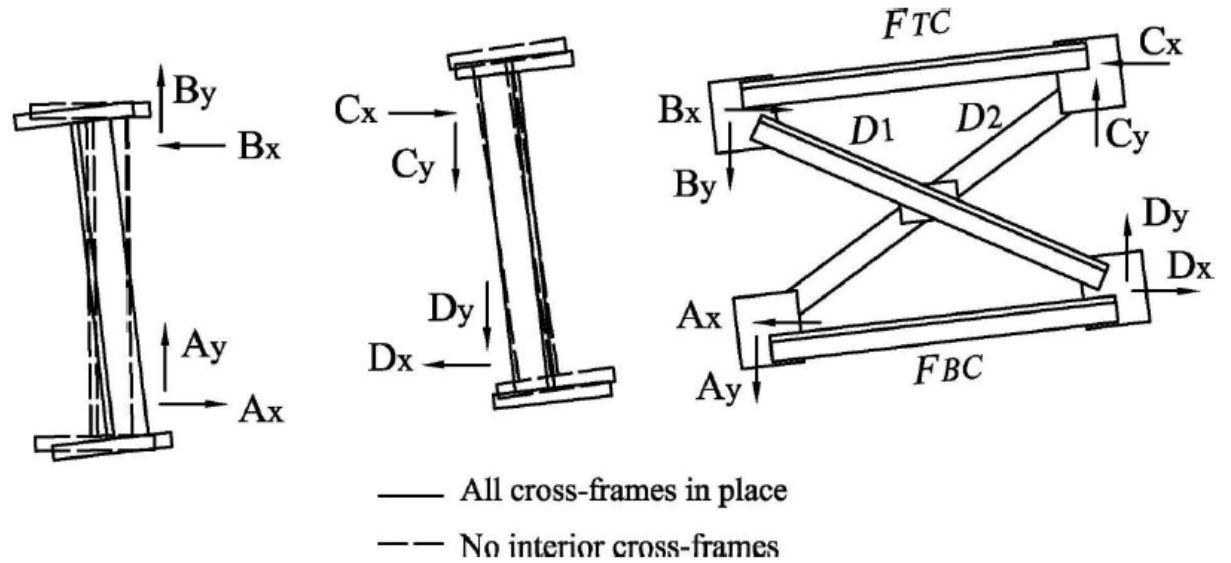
Internal forces in girders and cross-frames due to skew effects, from Sanchez (2011).
